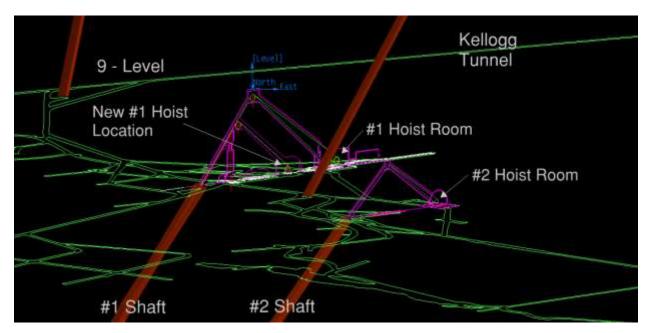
#1 & #2 Hoist Rooms Area View Looking North-Northwest
